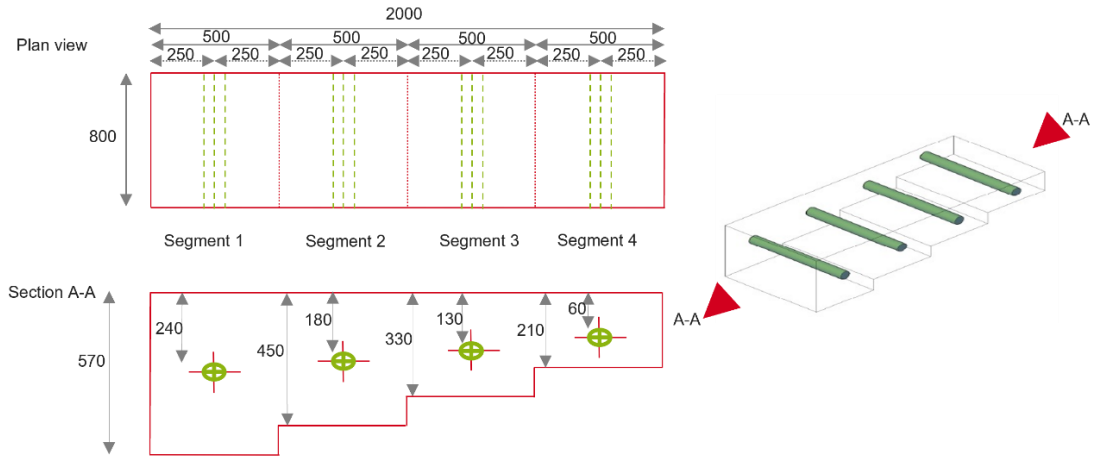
The schematic view of laboratory specimen (dimensions in mm).
